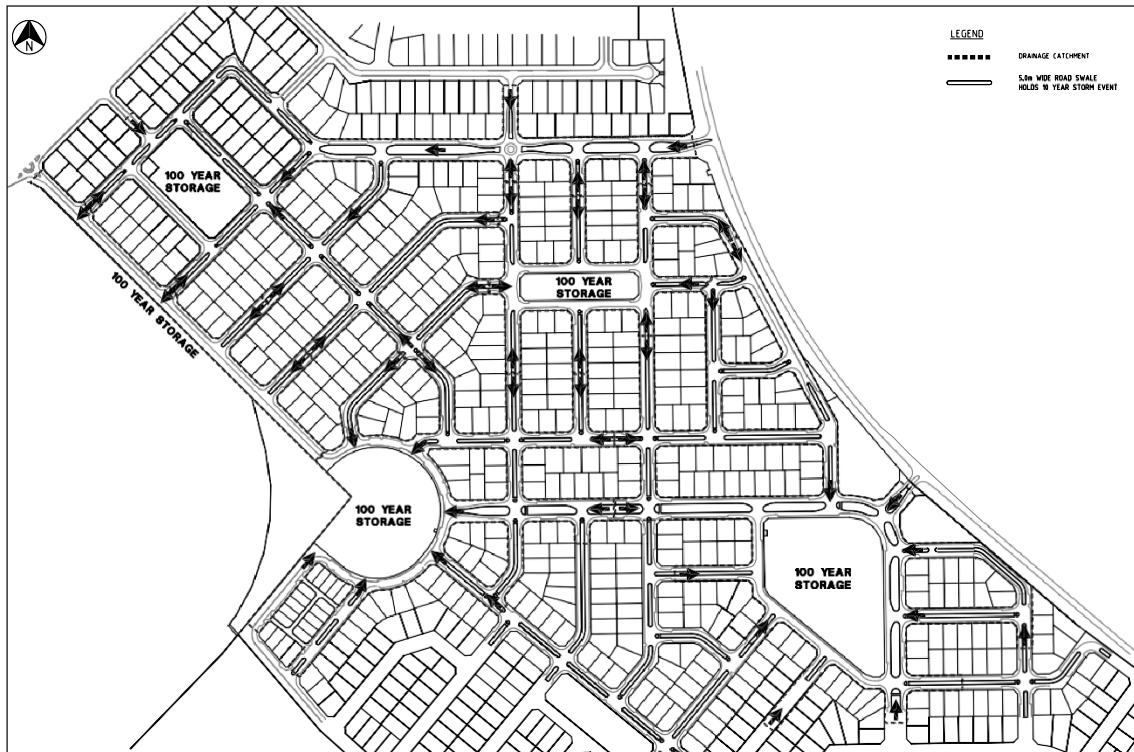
Overall drainage plan for Beachridge Estate. (Source: SKM 2007.)
